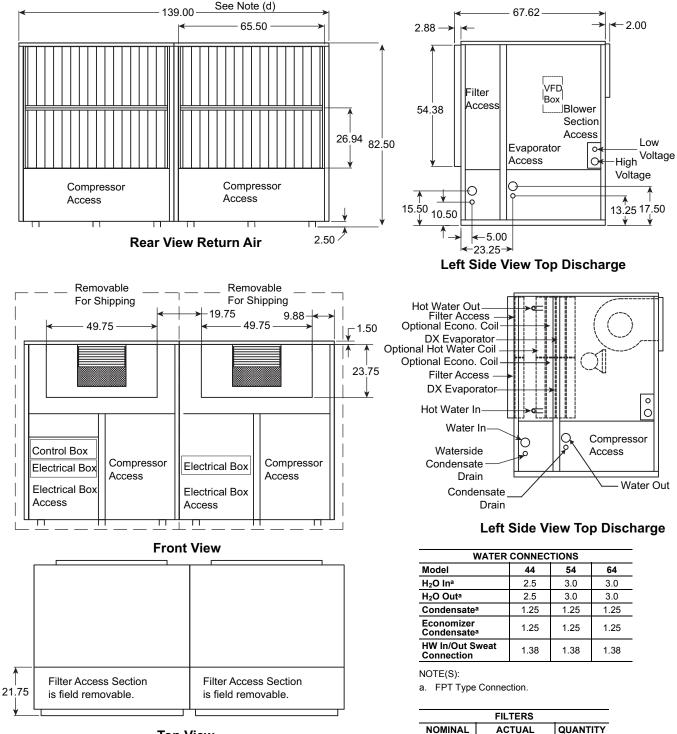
50BVT,V,W 044-064 (High Boy) Dimensions Rear Return, Front Supply with or without Waterside Economizer or Hot Water Coil
